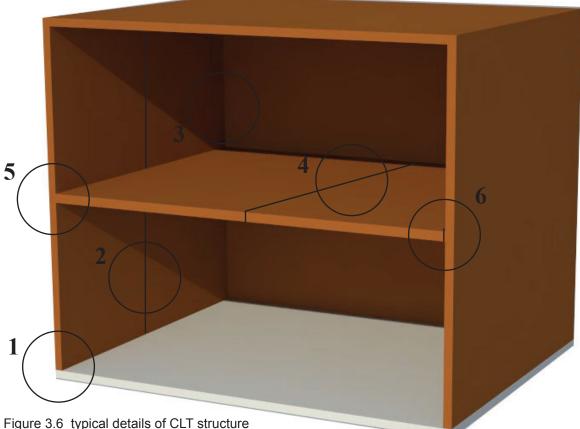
typical details of CLT structure Source: Trada WIS 2/3-61; Redrawn by the author
